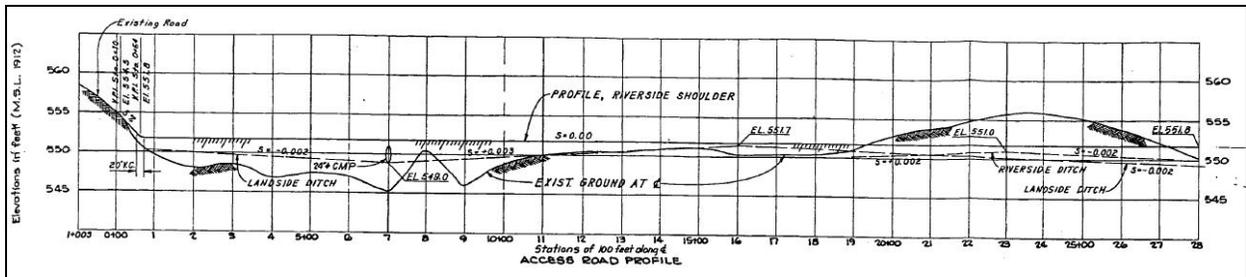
Drainage Ditch Design Profile (Sheet C-13, O&M Manual)
